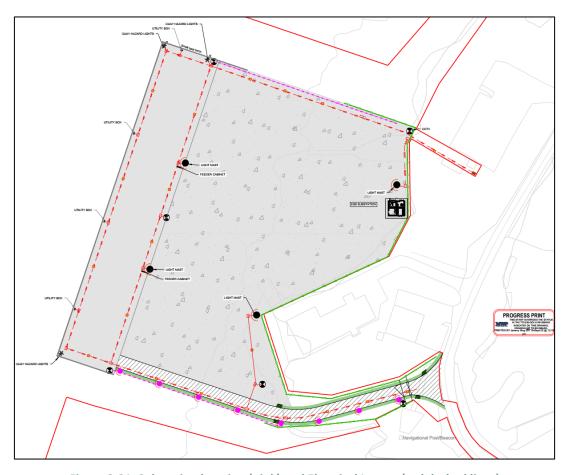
Substation location (pink) and Electrical Layout (red dashed lines)
